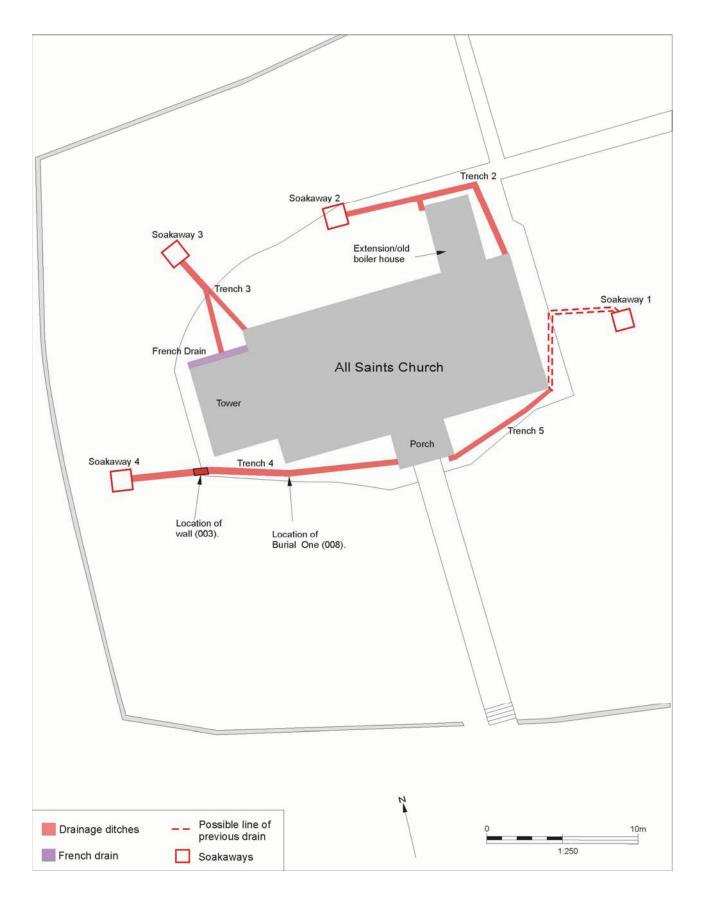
Plan of Elton church showing the location of the soakaways and associated drainage trenches.
